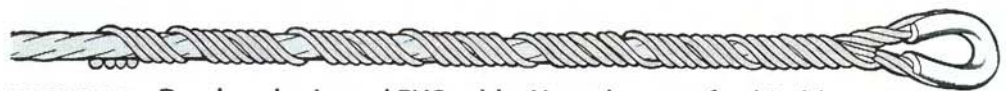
Dead-end grip and EHS cable. Note the use of a thimble.
